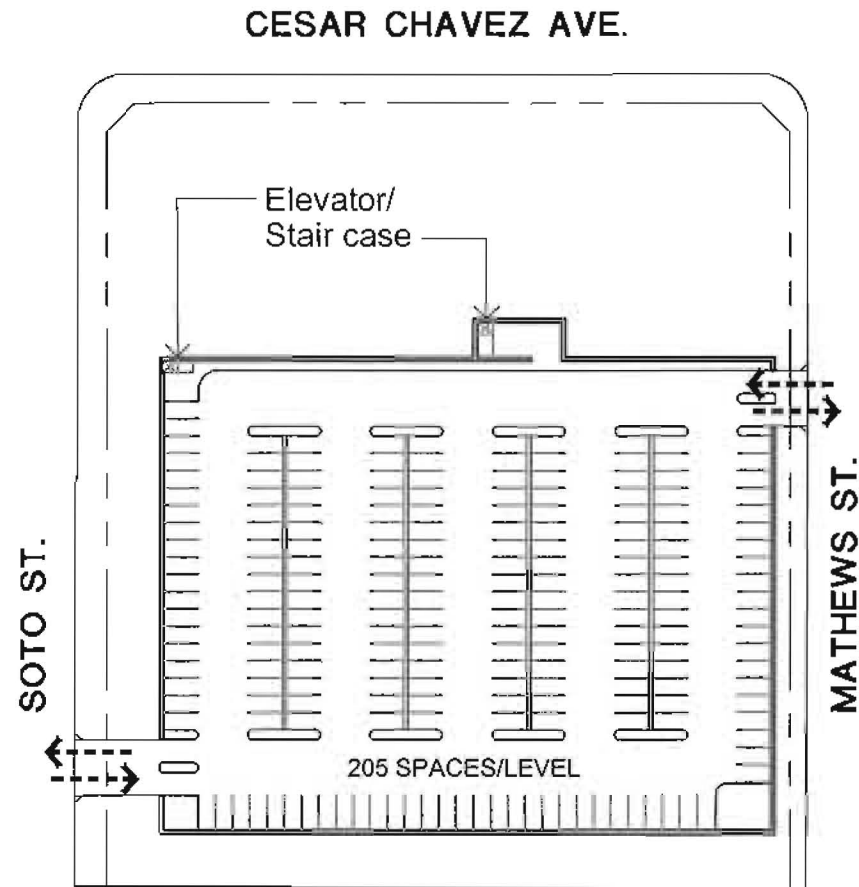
Development Concept Plan = 1st/ Boyle = Site No. 2
